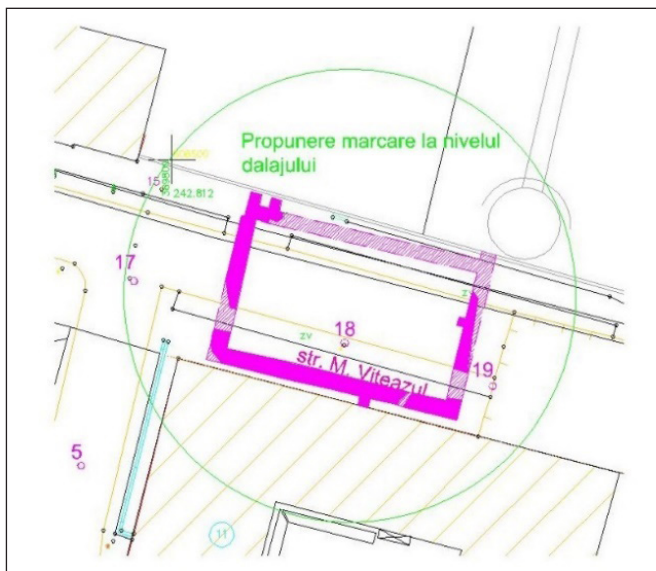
Thermae – Hall I*, the plan and marking proposal.
